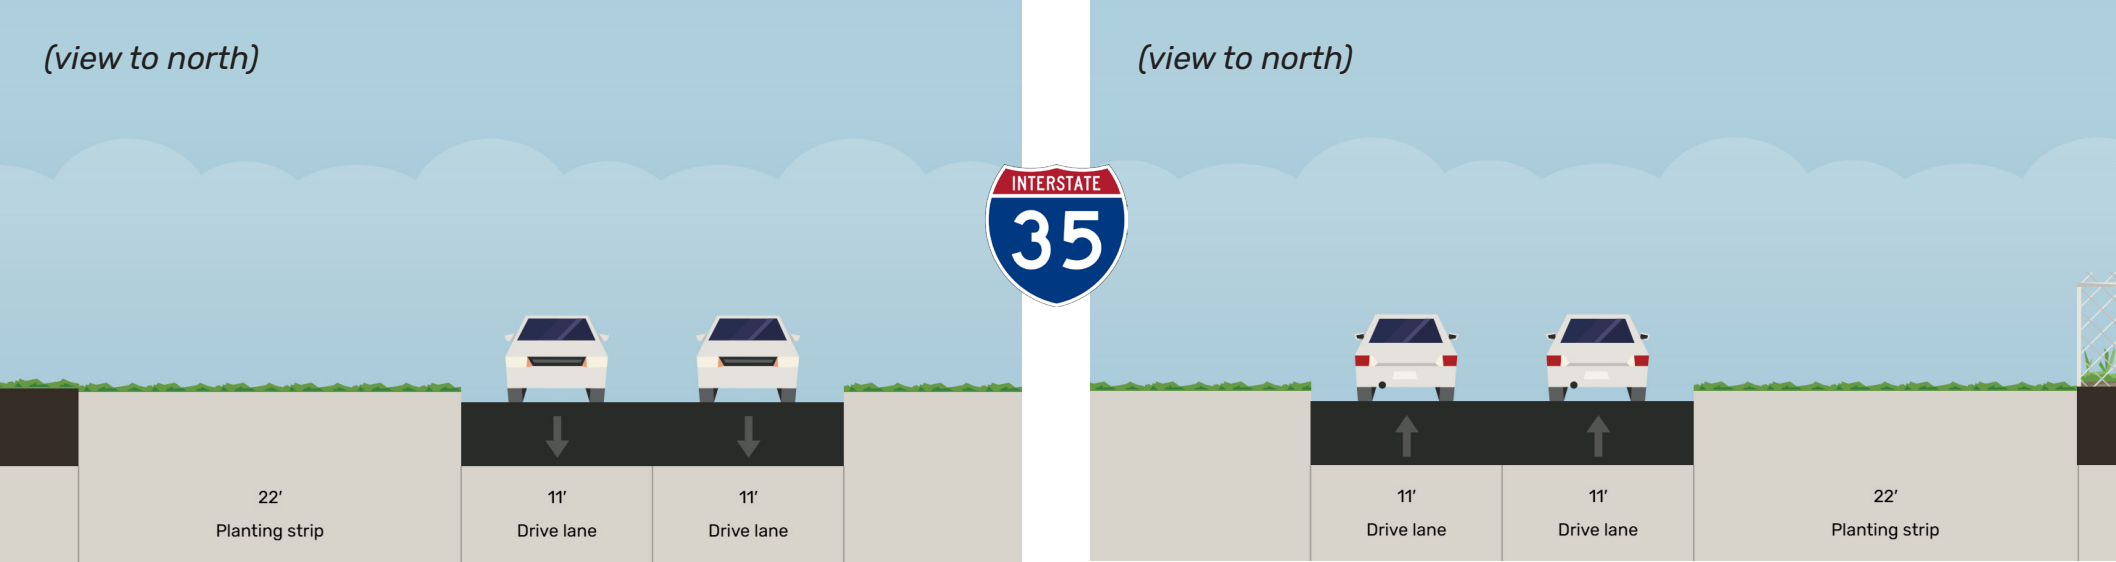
Proposed Typical Cross-Section on S. Stemmons Freeway (290' ROW)
